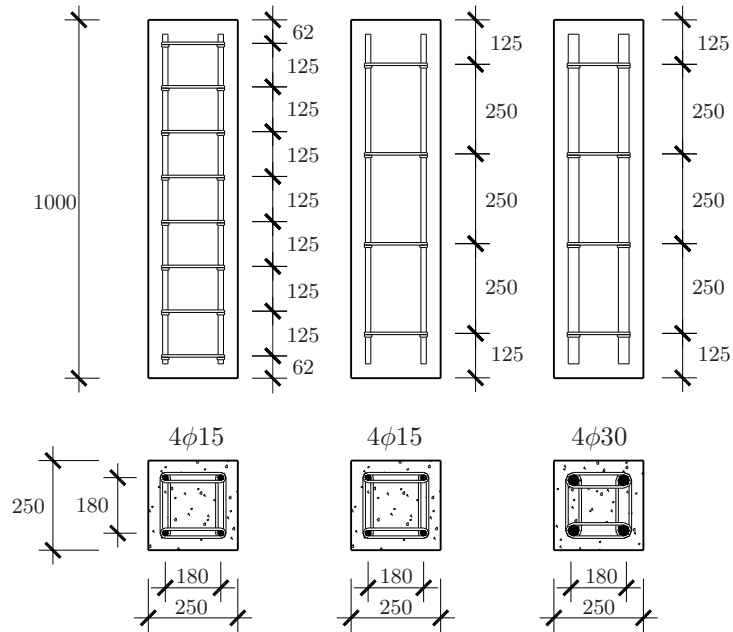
Bach's test specimens (adapted from Mörsch, 1909)
